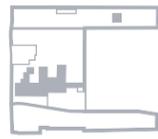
NORTH SUB-AREA MIXED-USE DISTRICT INFILL BUILDING TYPE CONCEPT
